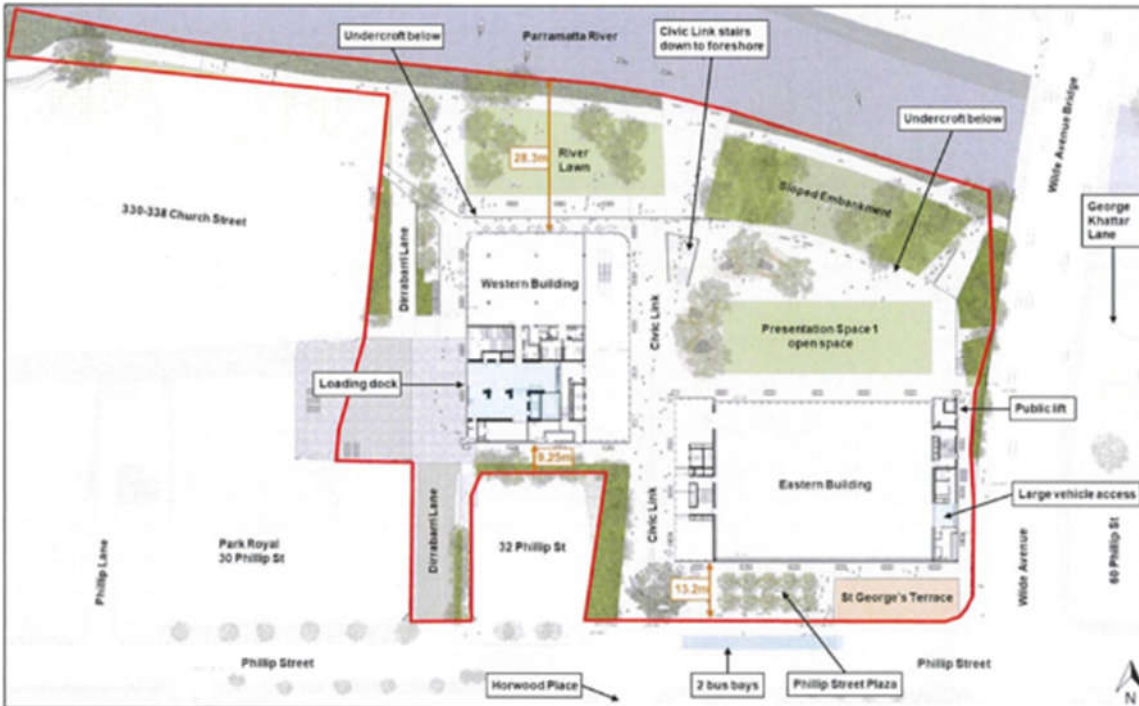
Proposed ground floor layout and key features (Source: Project RtS as modified by Powerhouse Parramatta (SSD 10416) Assessment Report, Department, 2021)
